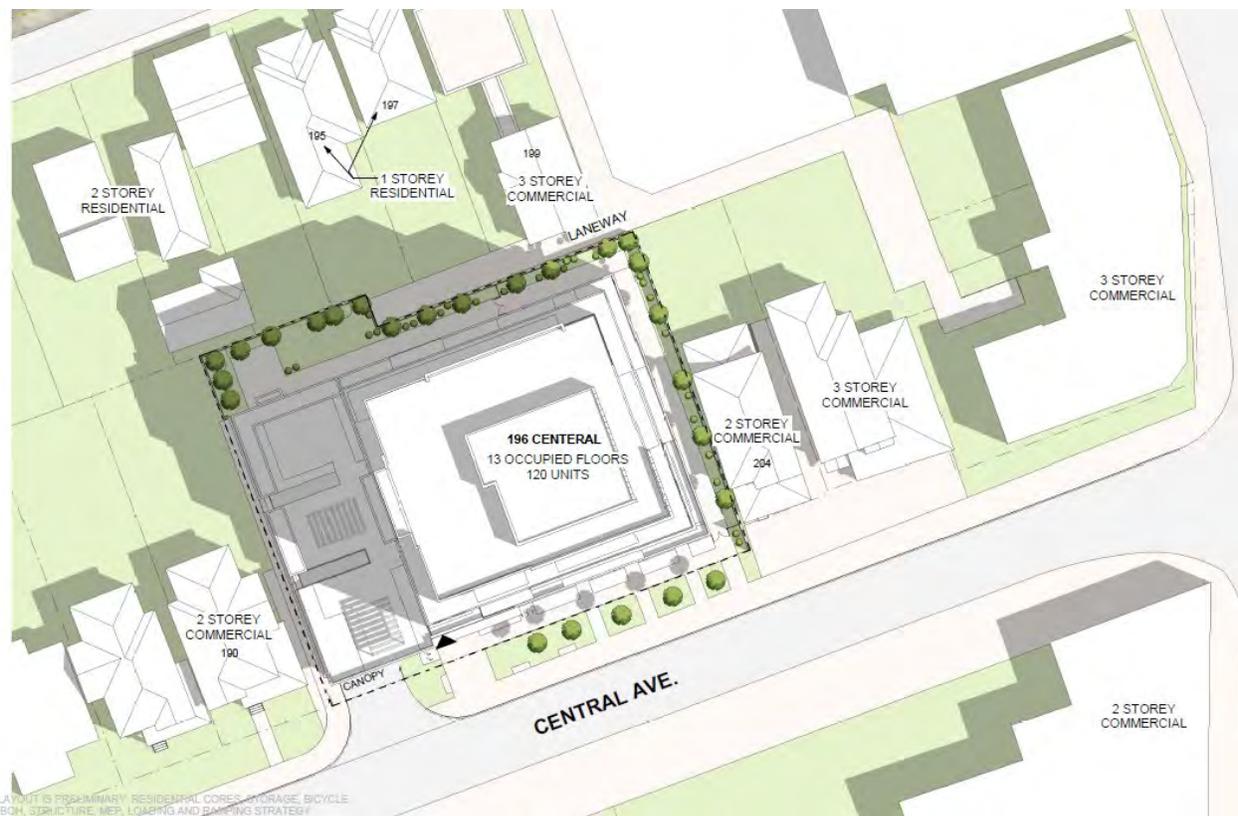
Proposed site plan (Source: SRM Architects Inc., 2023).
